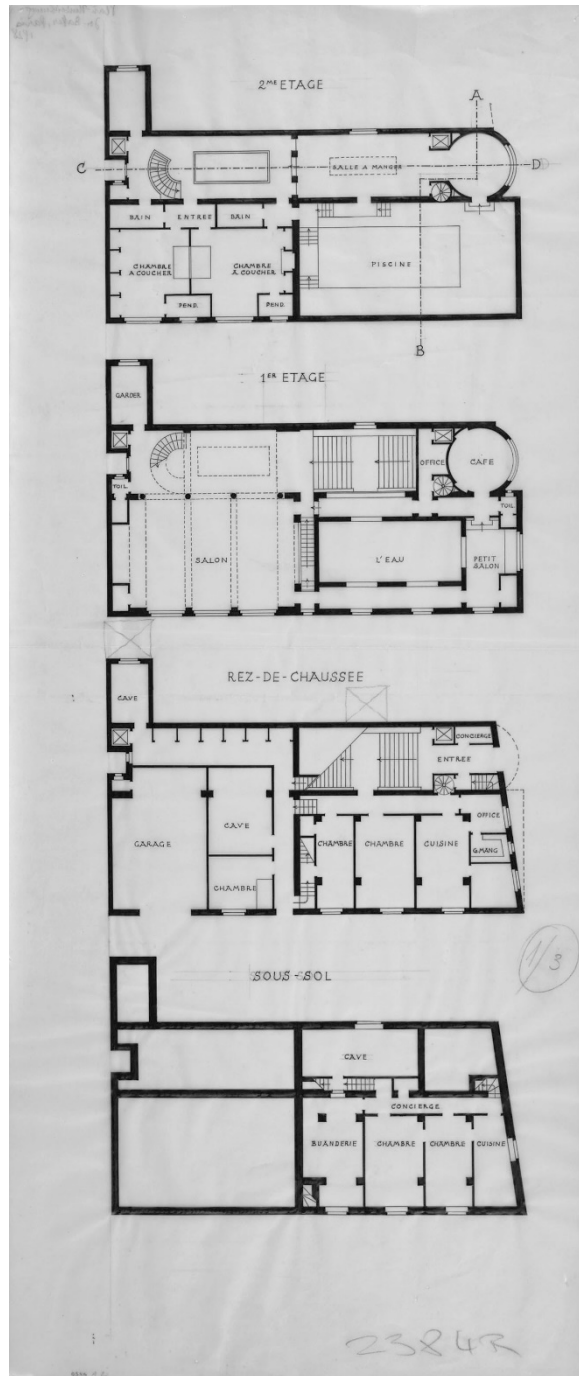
Adolf Loos: Josephine Baker House Plans, Unbuilt, Paris, 1927.
